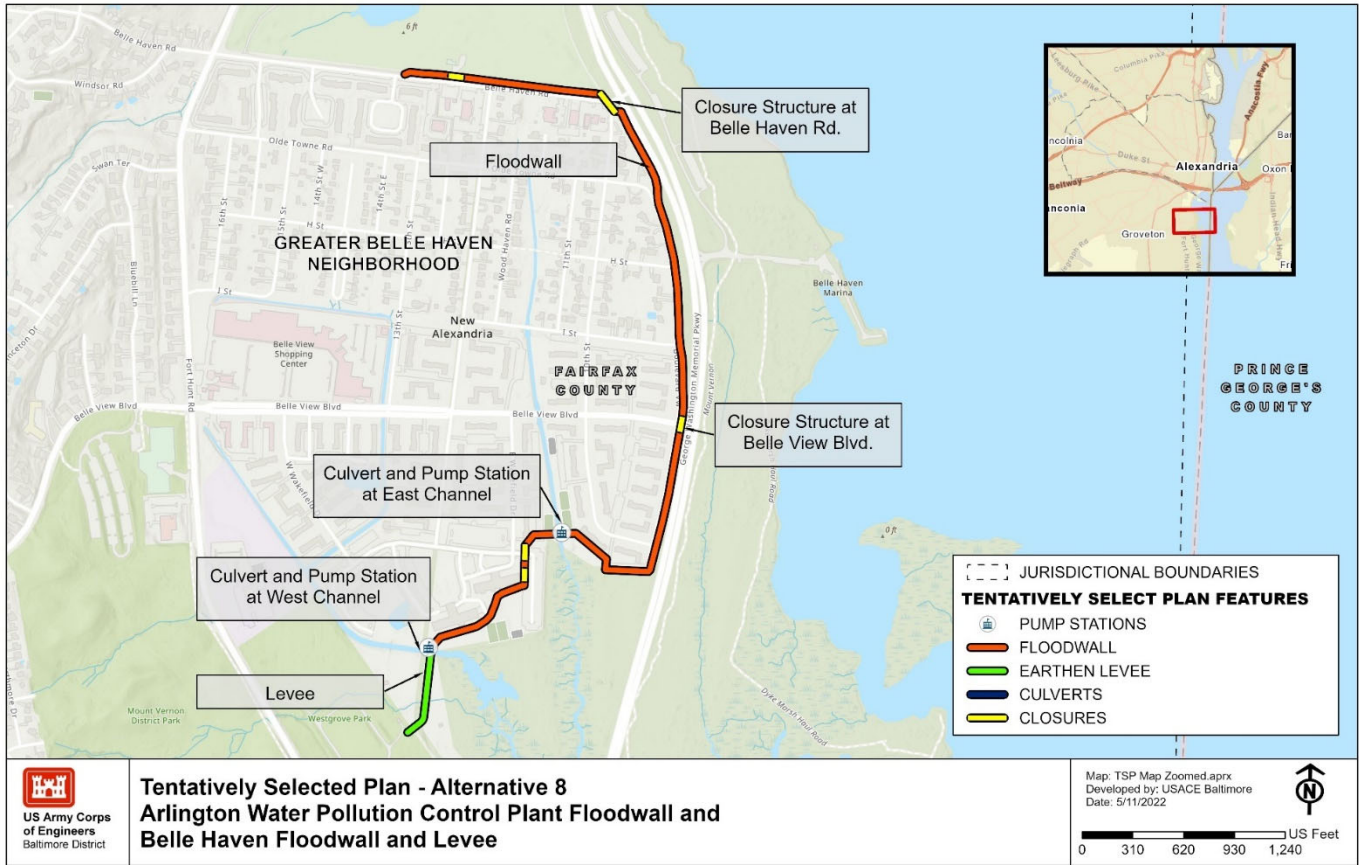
TENTATIVELY SELECTED PLAN – BELLE HAVEN FLOODWALL AND LEVEE
